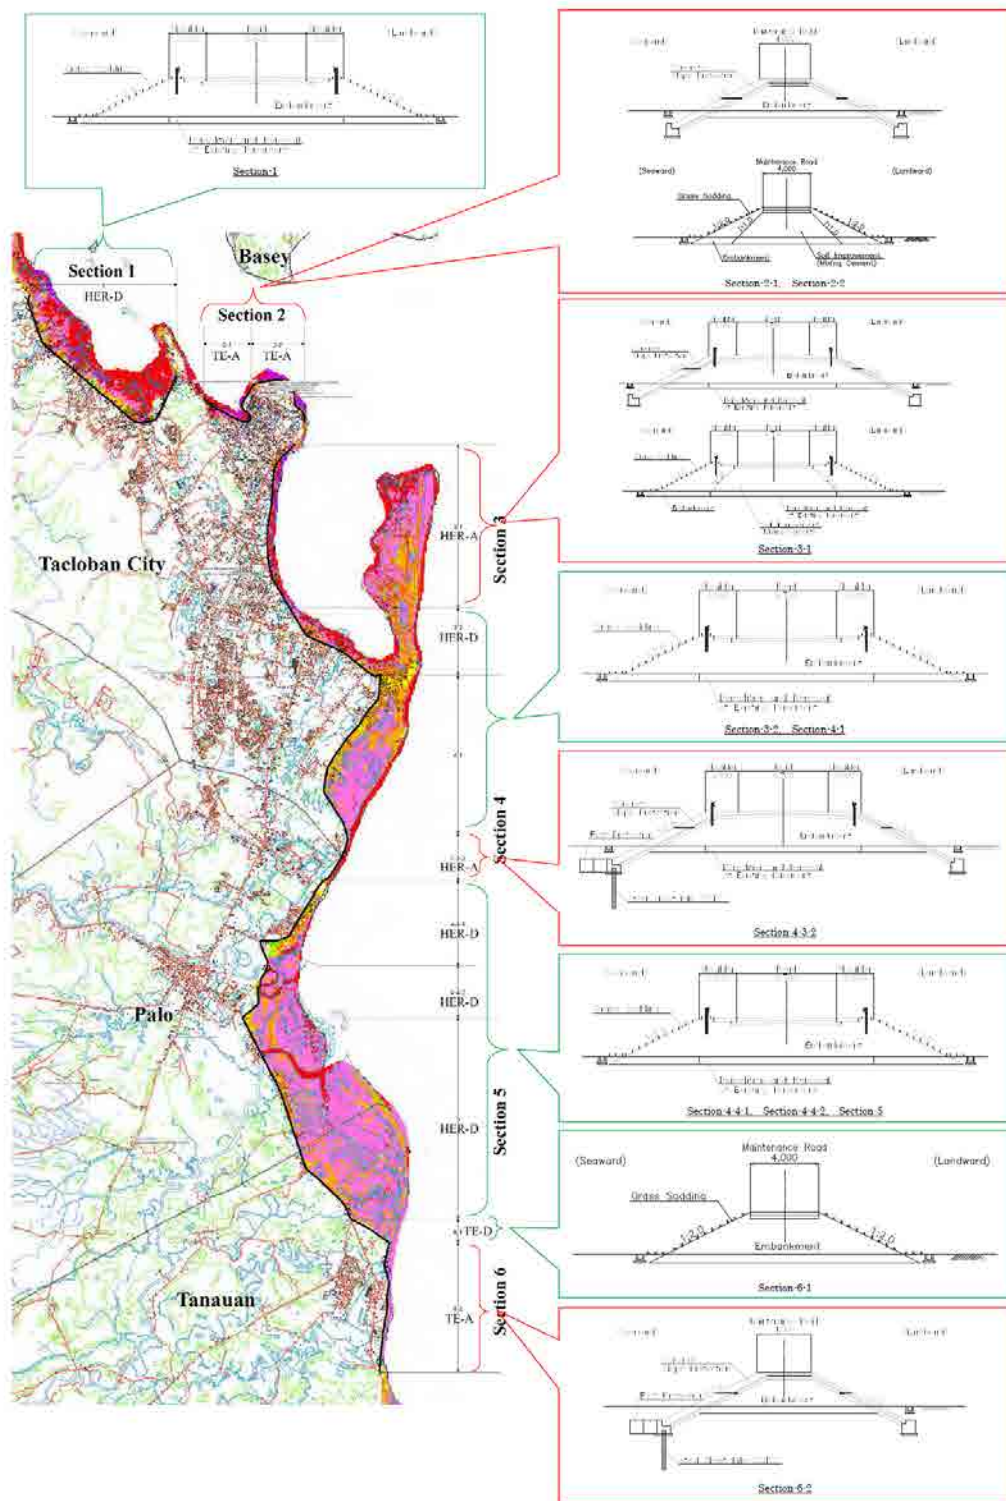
Plan view of the proposed embankment road alignment along east coast of Leyte Island / Standard cross-section of the proposed embankment road
